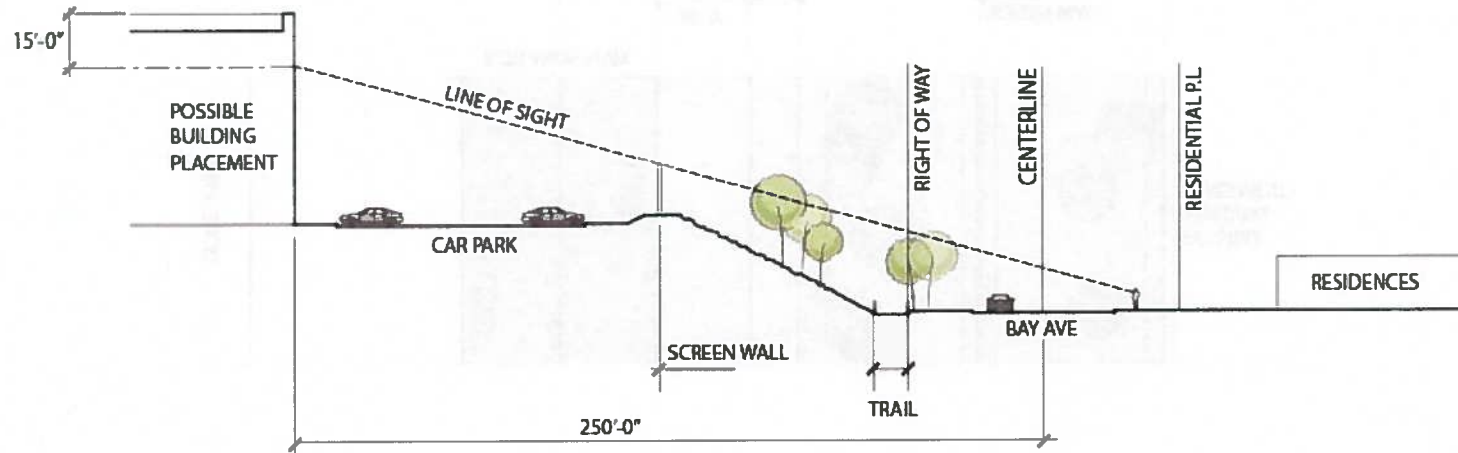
, 4-12 Merwin Street Section E and Plan View E (pg.4-9)
